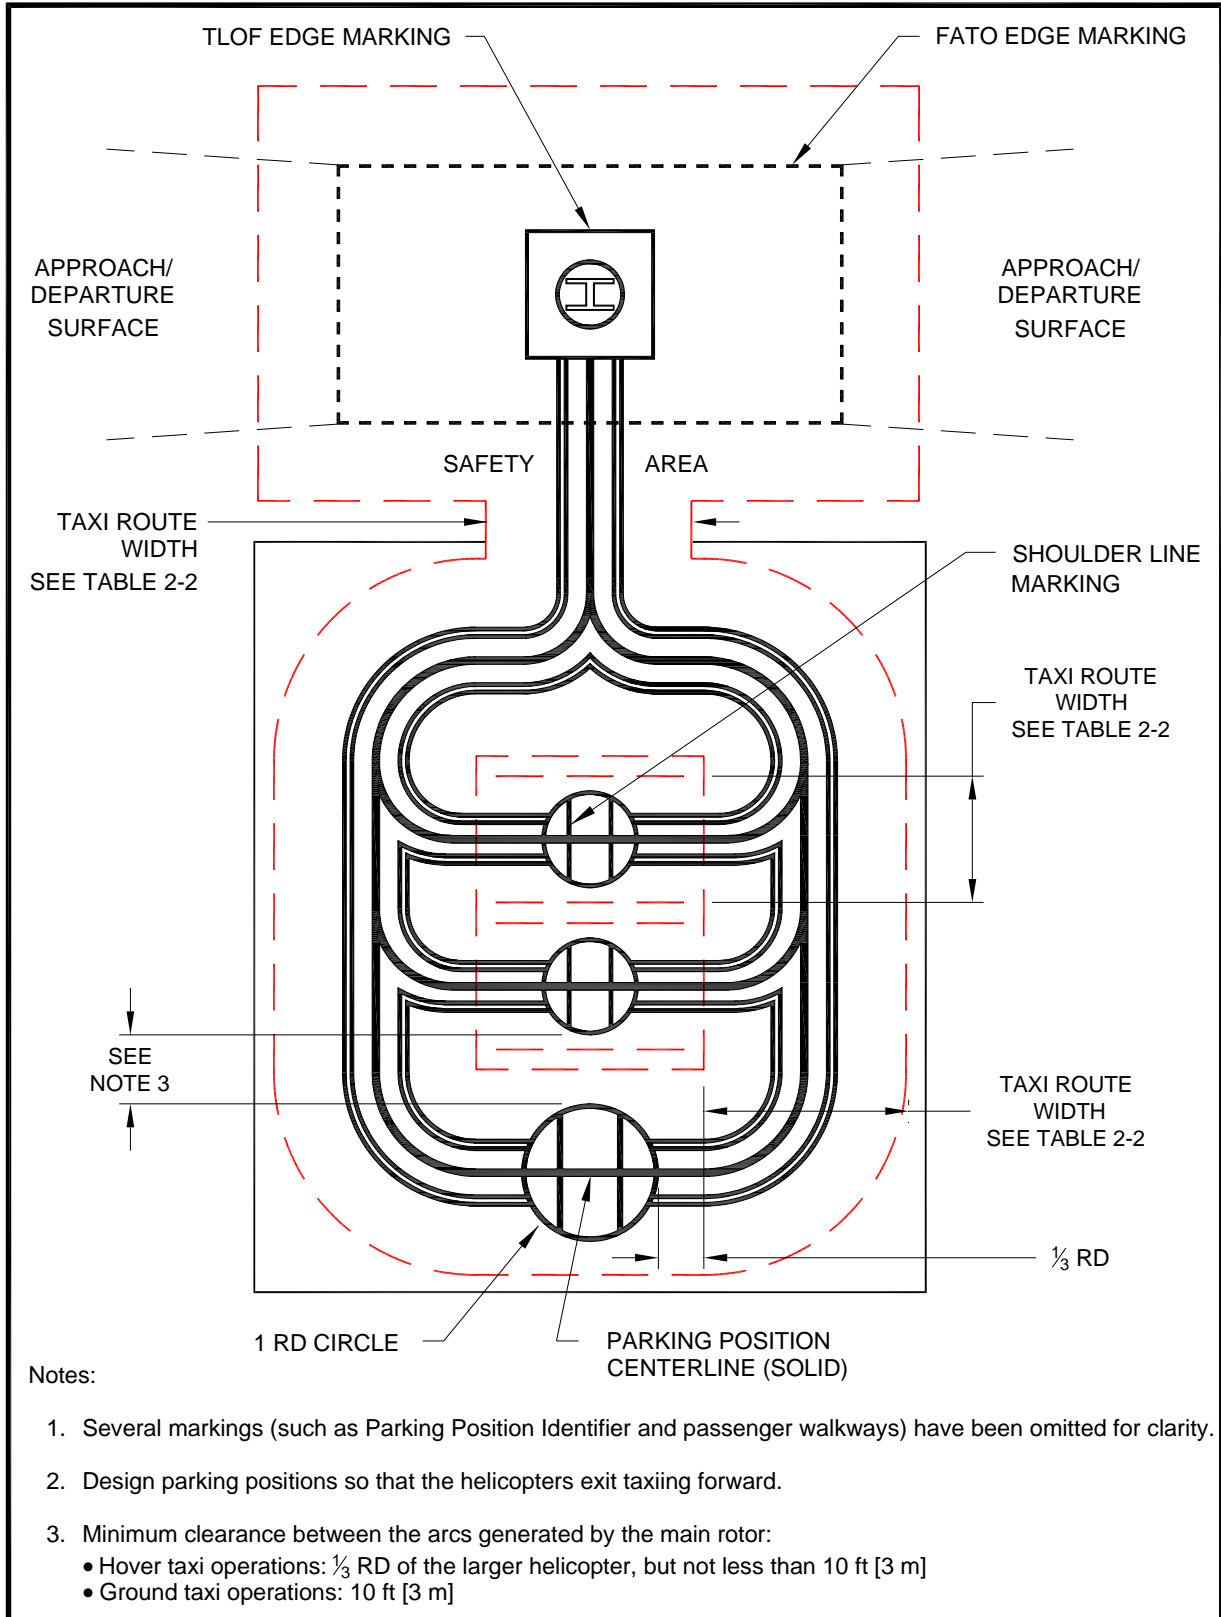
Parking Area Design – “Taxi-through” Parking Position
